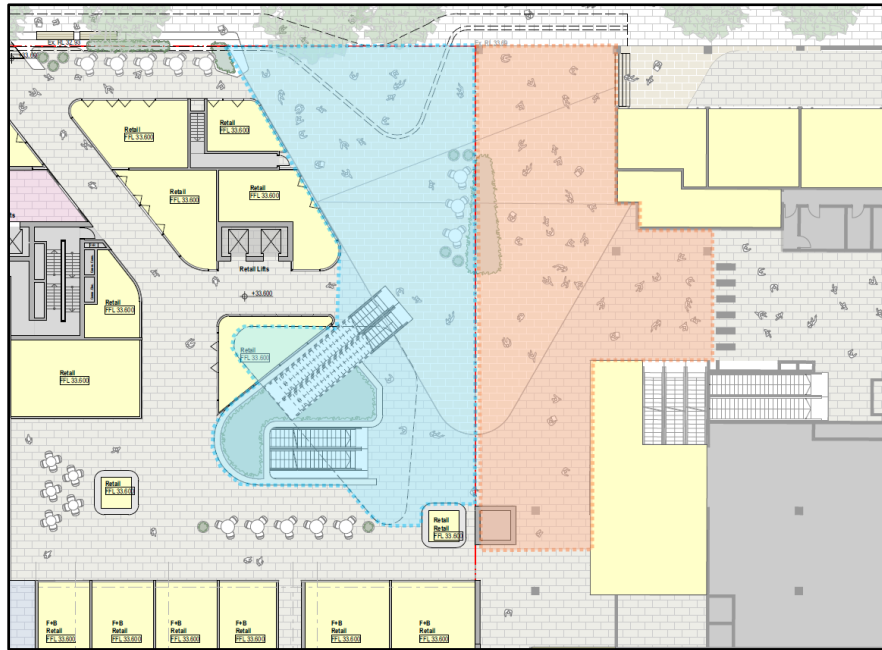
Ground Floor Plan – Train Concourse/Entry and Plaza
